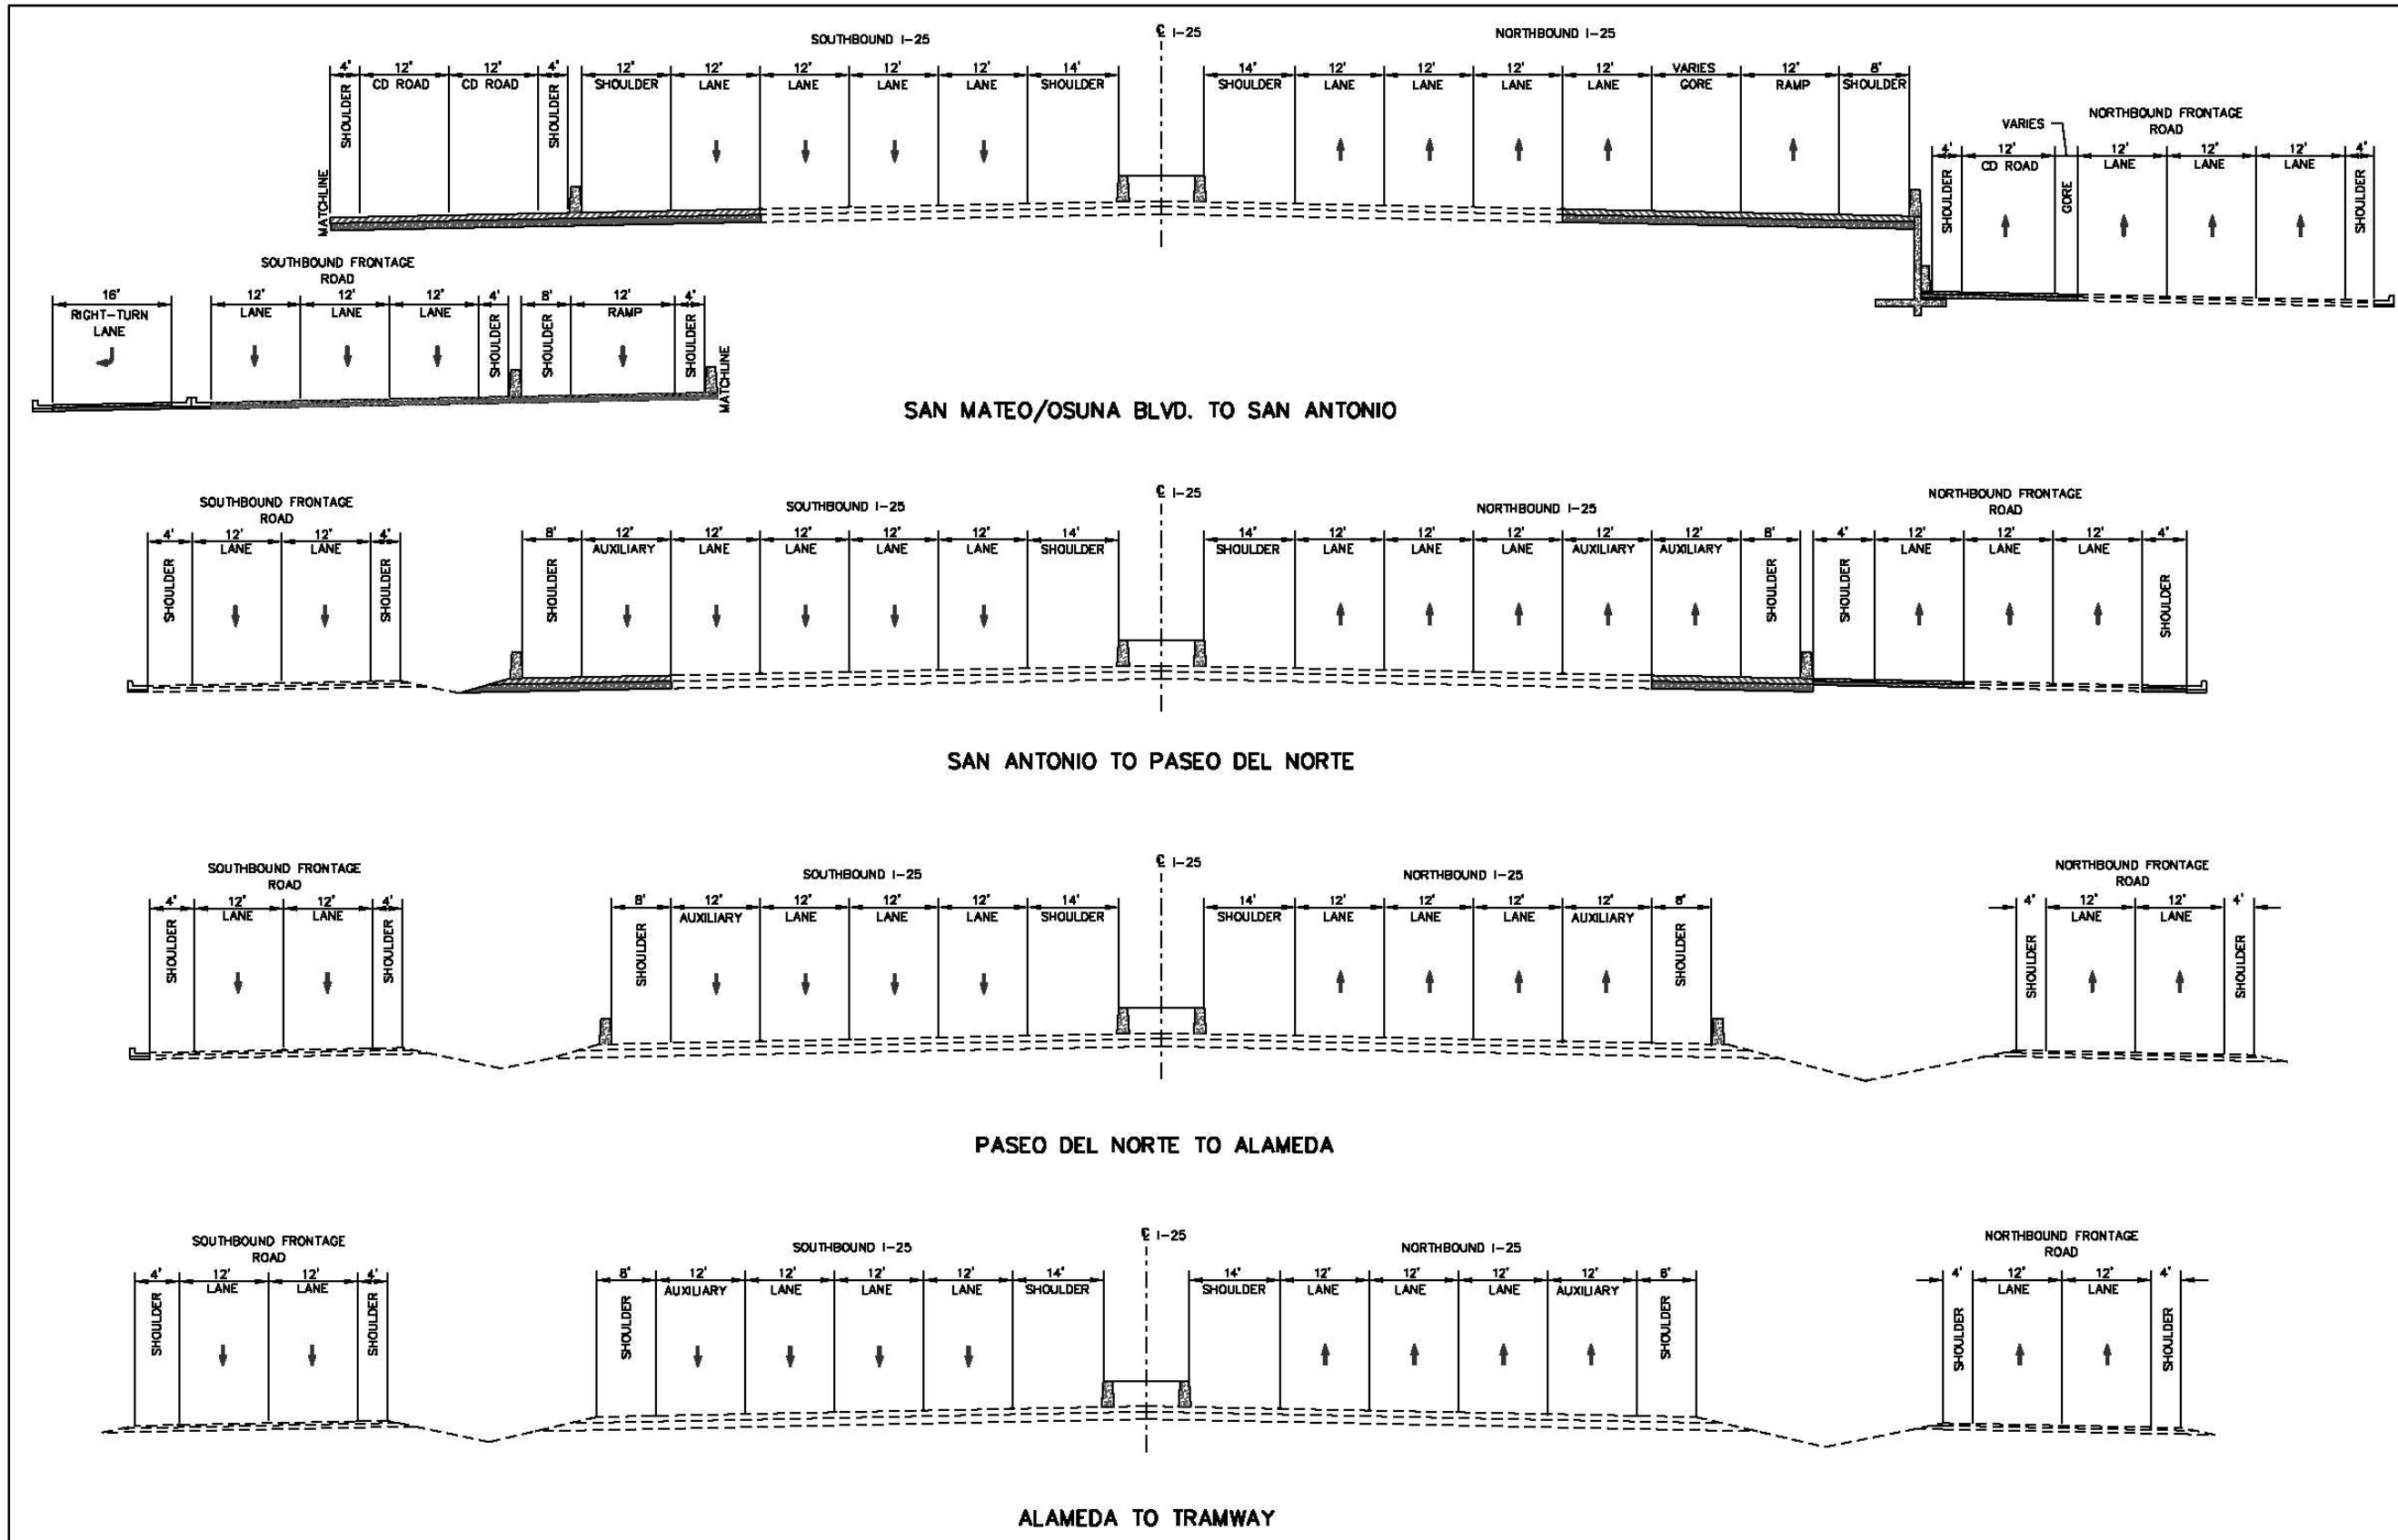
, Build Alternative 2 Typical Sections (continued)
